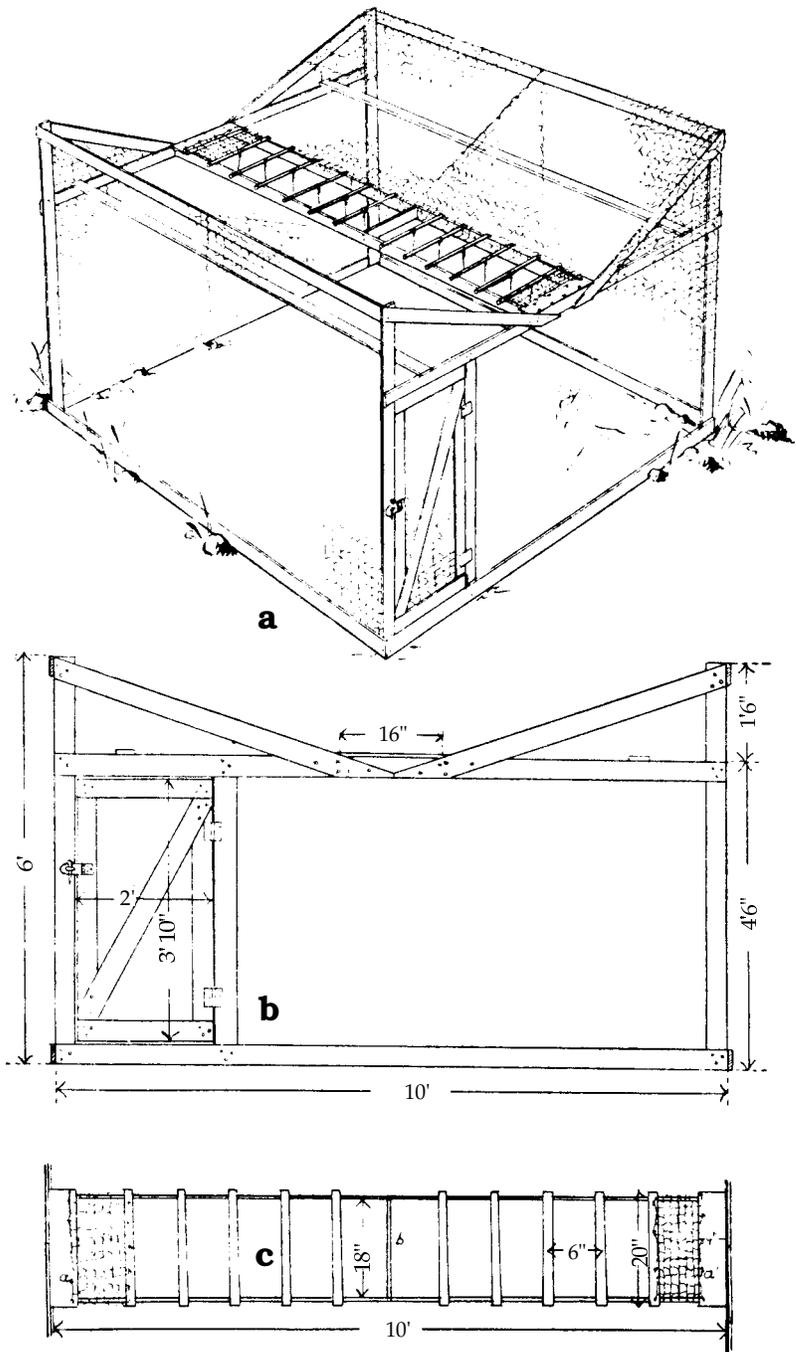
Australian crow trap: (a) completed trap, (b) end view, and (c) plan of "ladder" opening.
